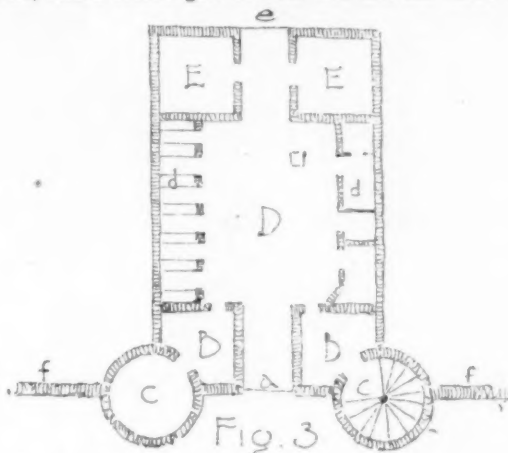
Typical Plan of Gate-tower: B. Gate-tower; a. Archway; c. Flanking-towers; D. Court; d. Hostleries; d'. Dog stall; E, E. Postern-tower; e. archway; f. City wall.
